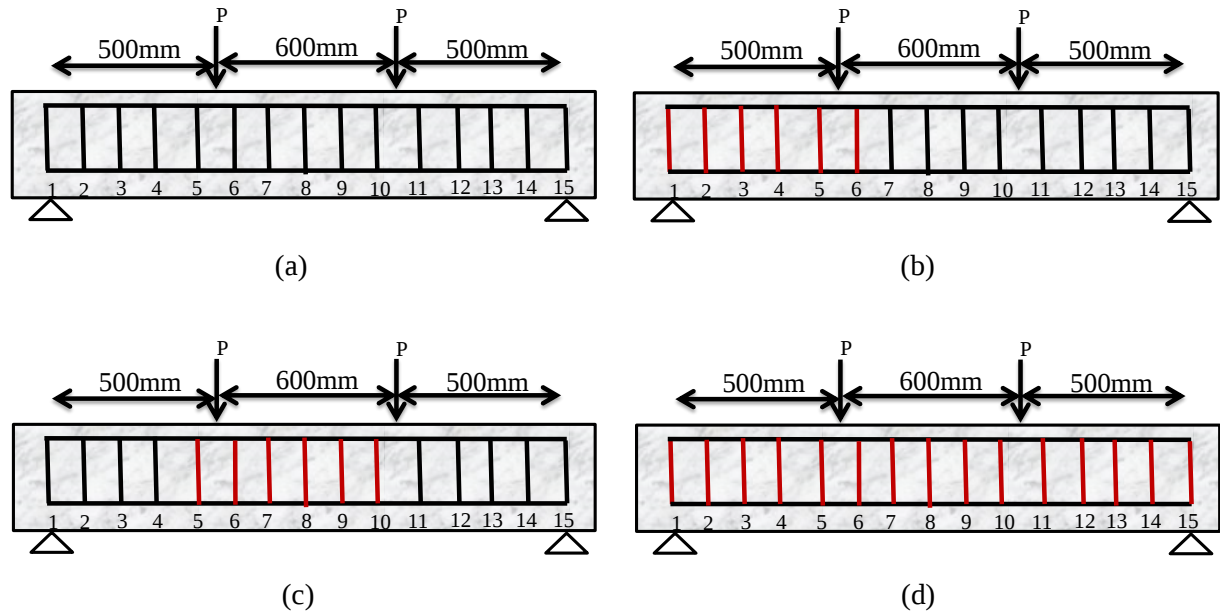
Corrosion of stirrups at different locations, (a) Control beams with no corrosion, (b) Corrosion of stirrups in the shear span, (c) Corrosion of stirrups in the middle span, and (d) Corrosion of stirrups in the full span
